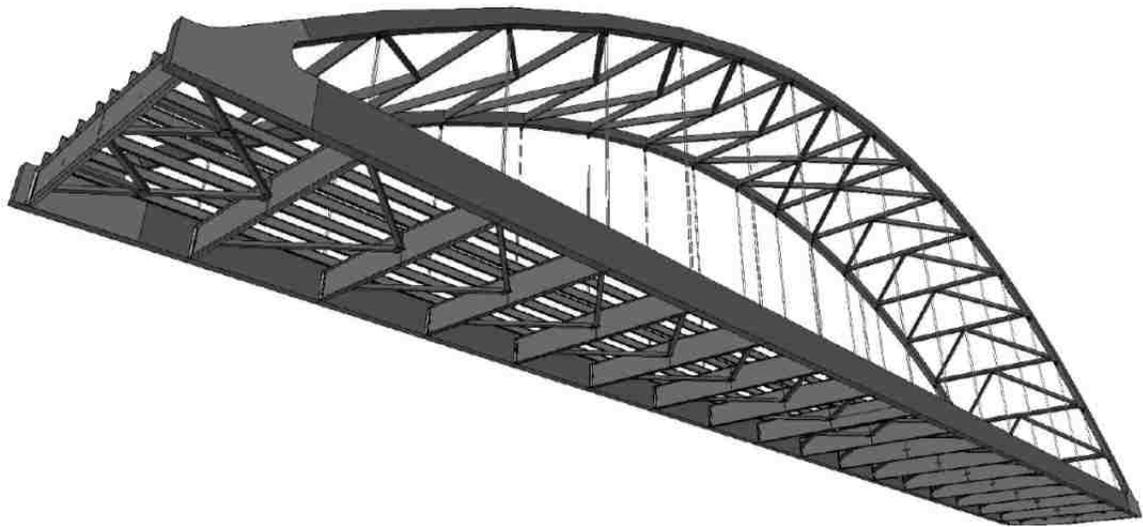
View of Floorsystem and Arch Tie-Girders
